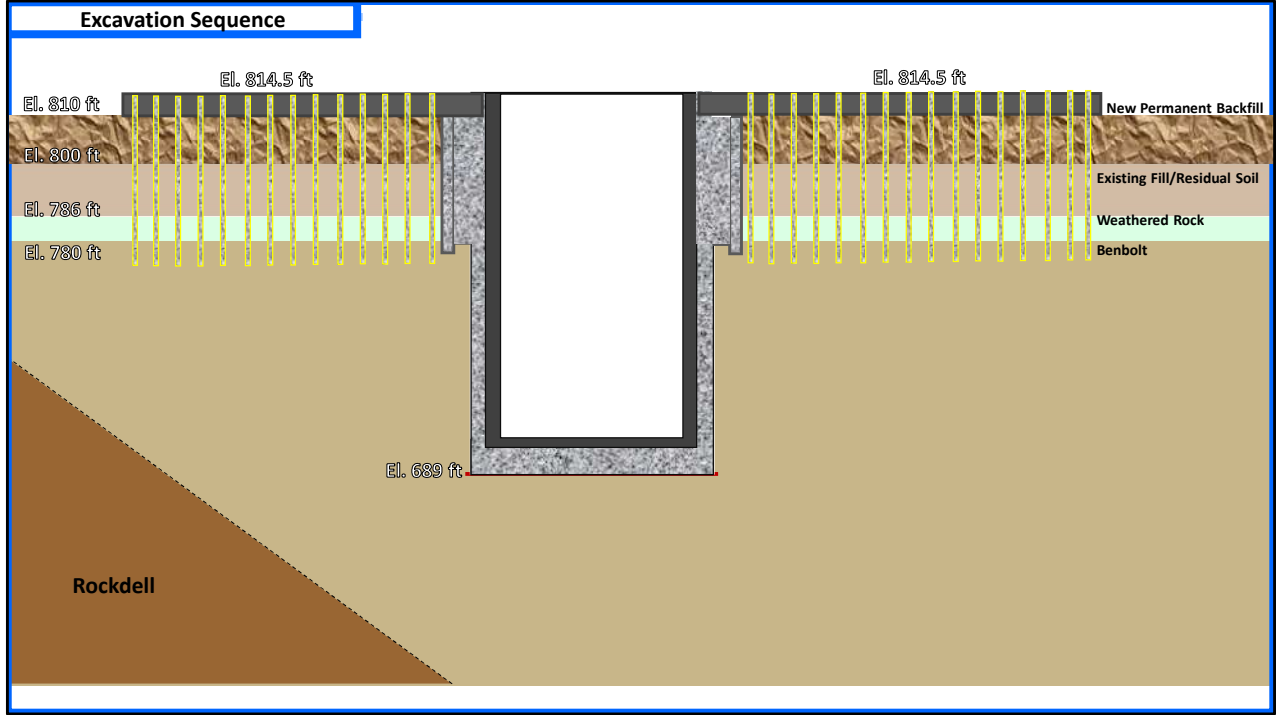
Surrounding powerblock foundations installed in parallel with RB installation (after CP Issuance)
